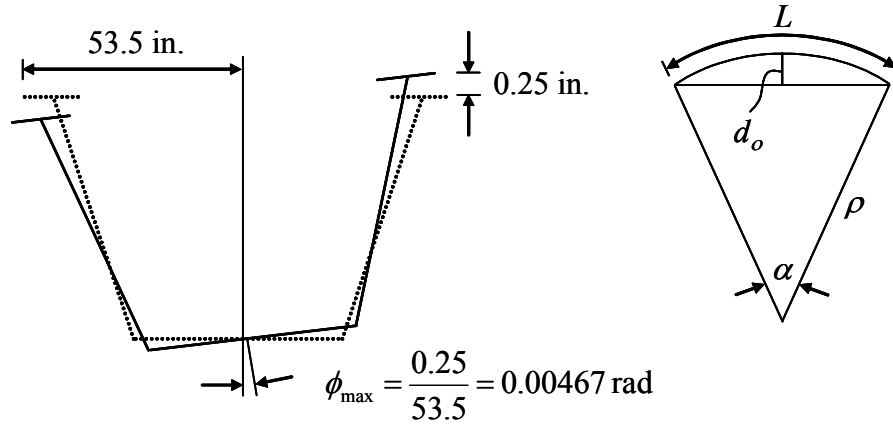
GIRDER TWIST AND PLAN VIEW OF SECTOR
